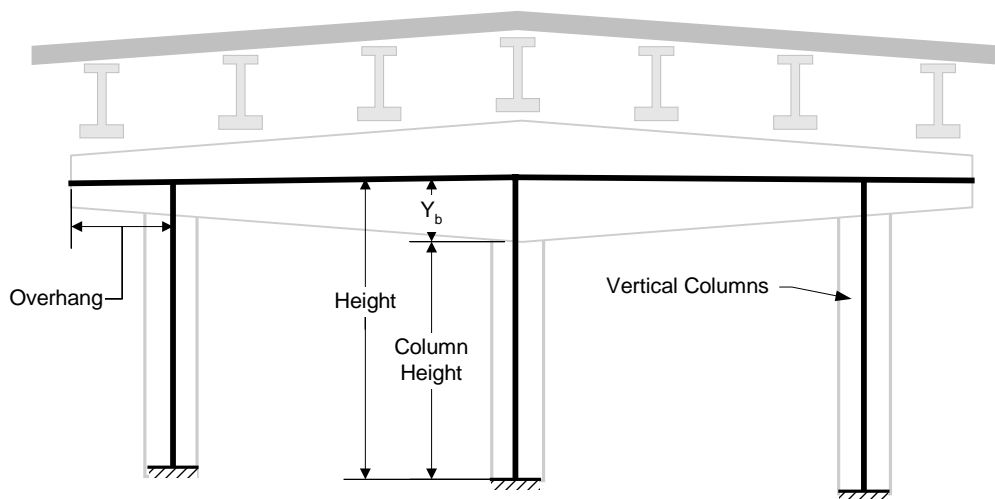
TBAM for Multicolumn and Hammerhead Piers
